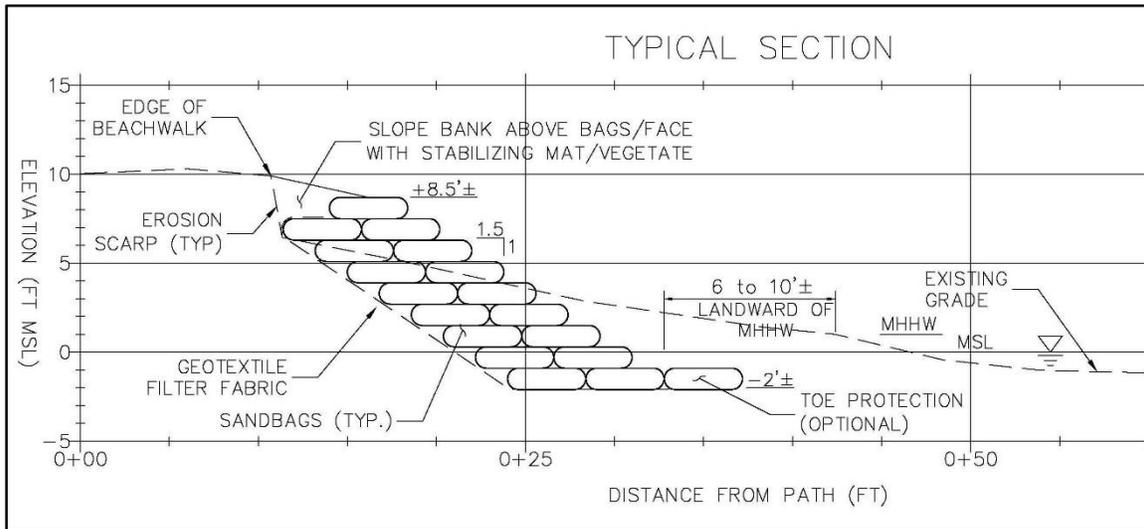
Typical cross section of proposed sandbag slope stabilization
